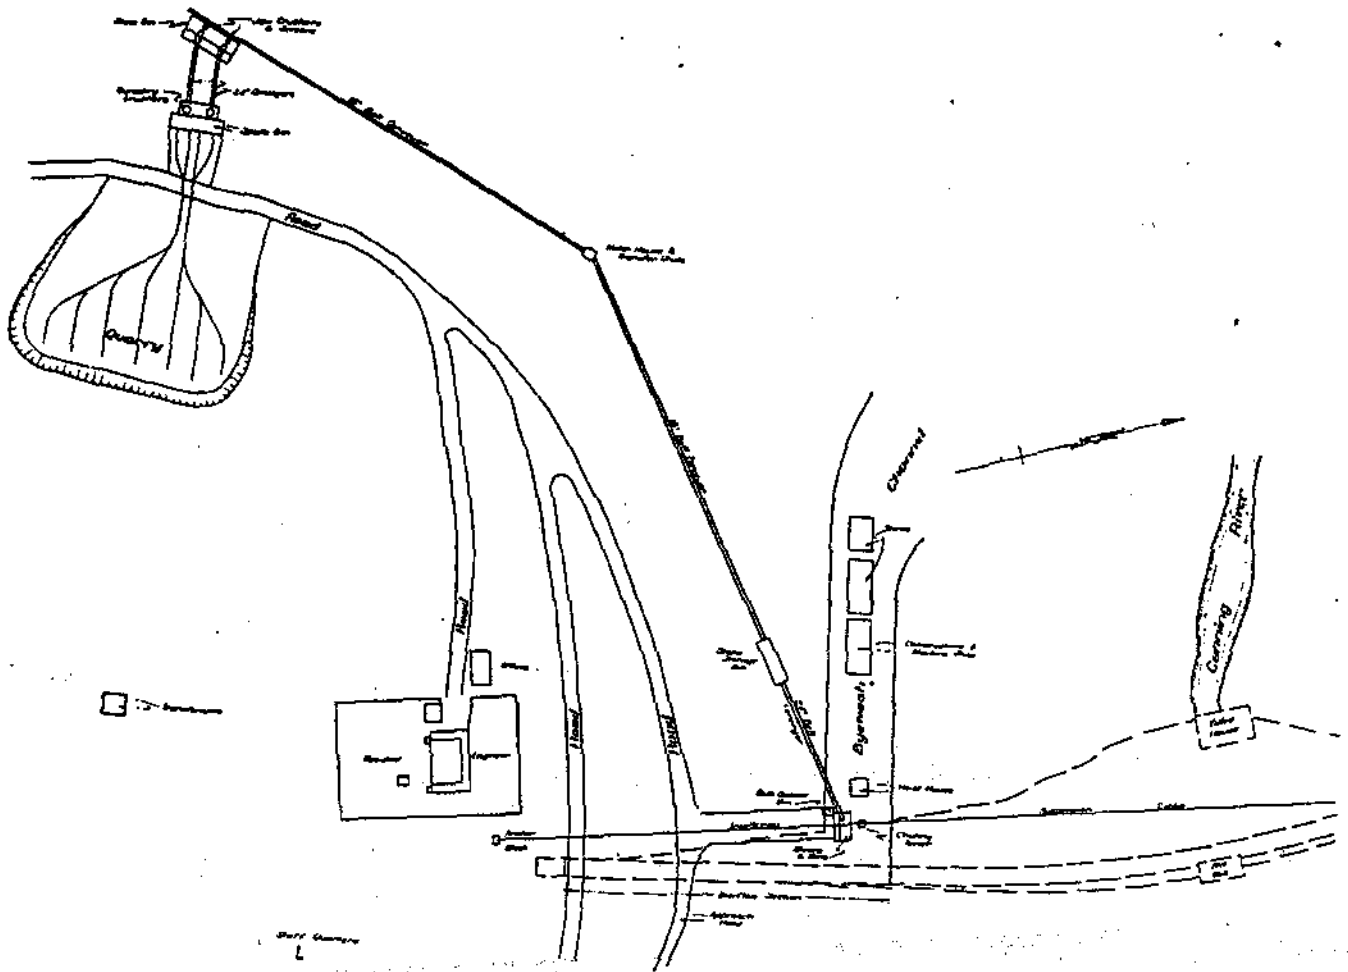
Plan of Canning Dam, Showing Layout of Plant.
